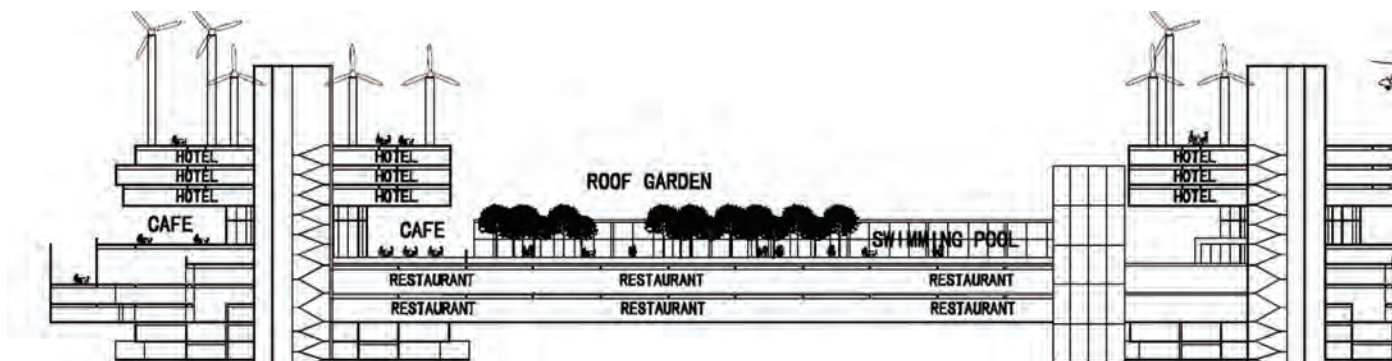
Section of entertainment units' secondary ground. Source: YangXu, Huang Yiru.
